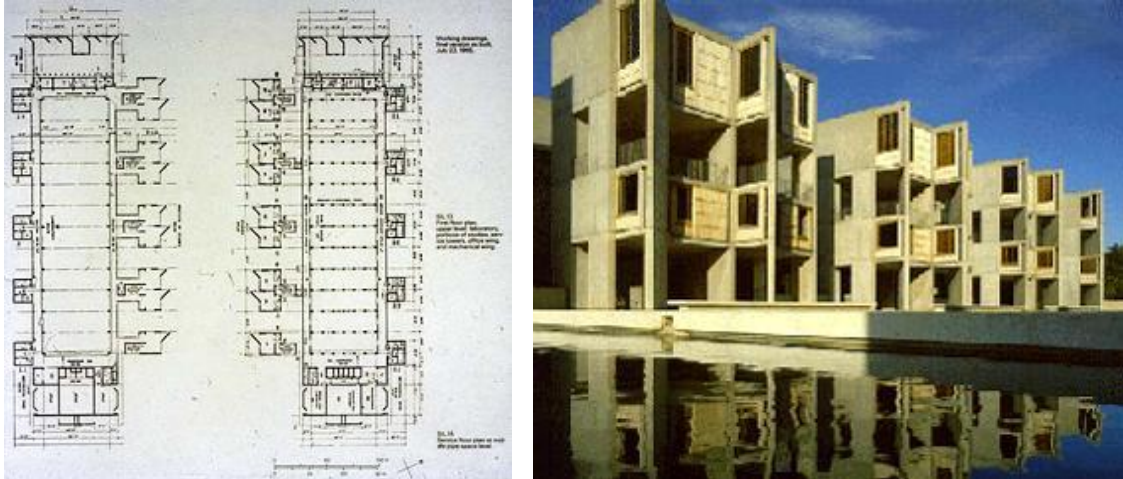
Salk Institute, San Diego, Floor Plan (left) and Exterior Photo (right) (ArchINFORM, 2012)
